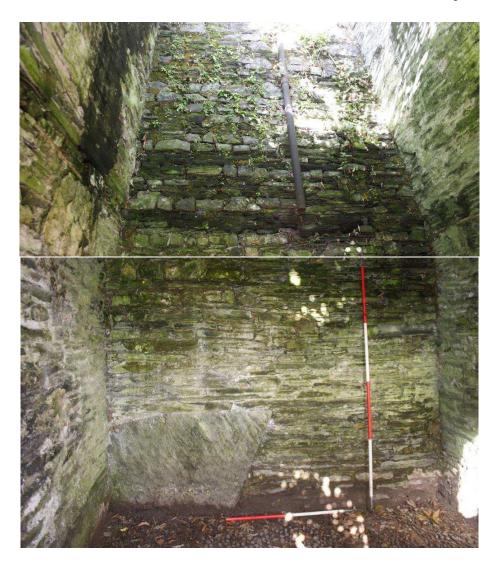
Composite photograph showing southeastern elevation of Eastern Curtain Wall within southern half of Room 1 of Stables, 2m and 1m scale
